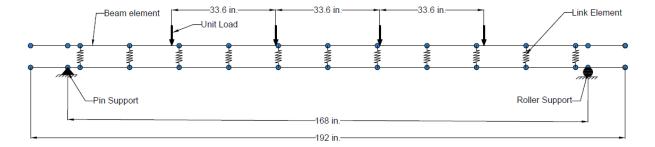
Example of a Full-scale specimen modeled using the Beam Spring Model
